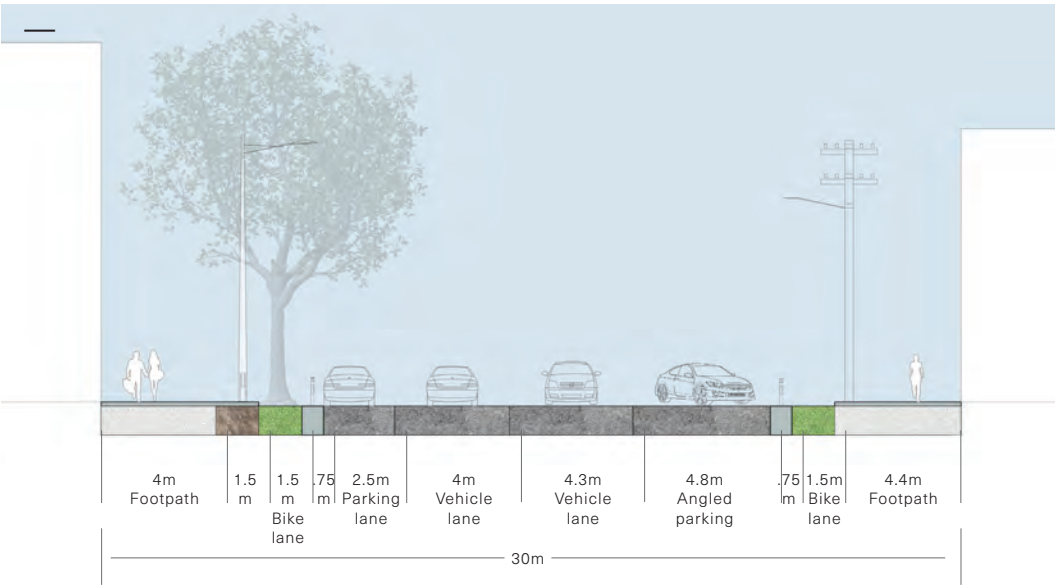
Gheringhap Street block 3-6 section A-A' showing the existing condition
